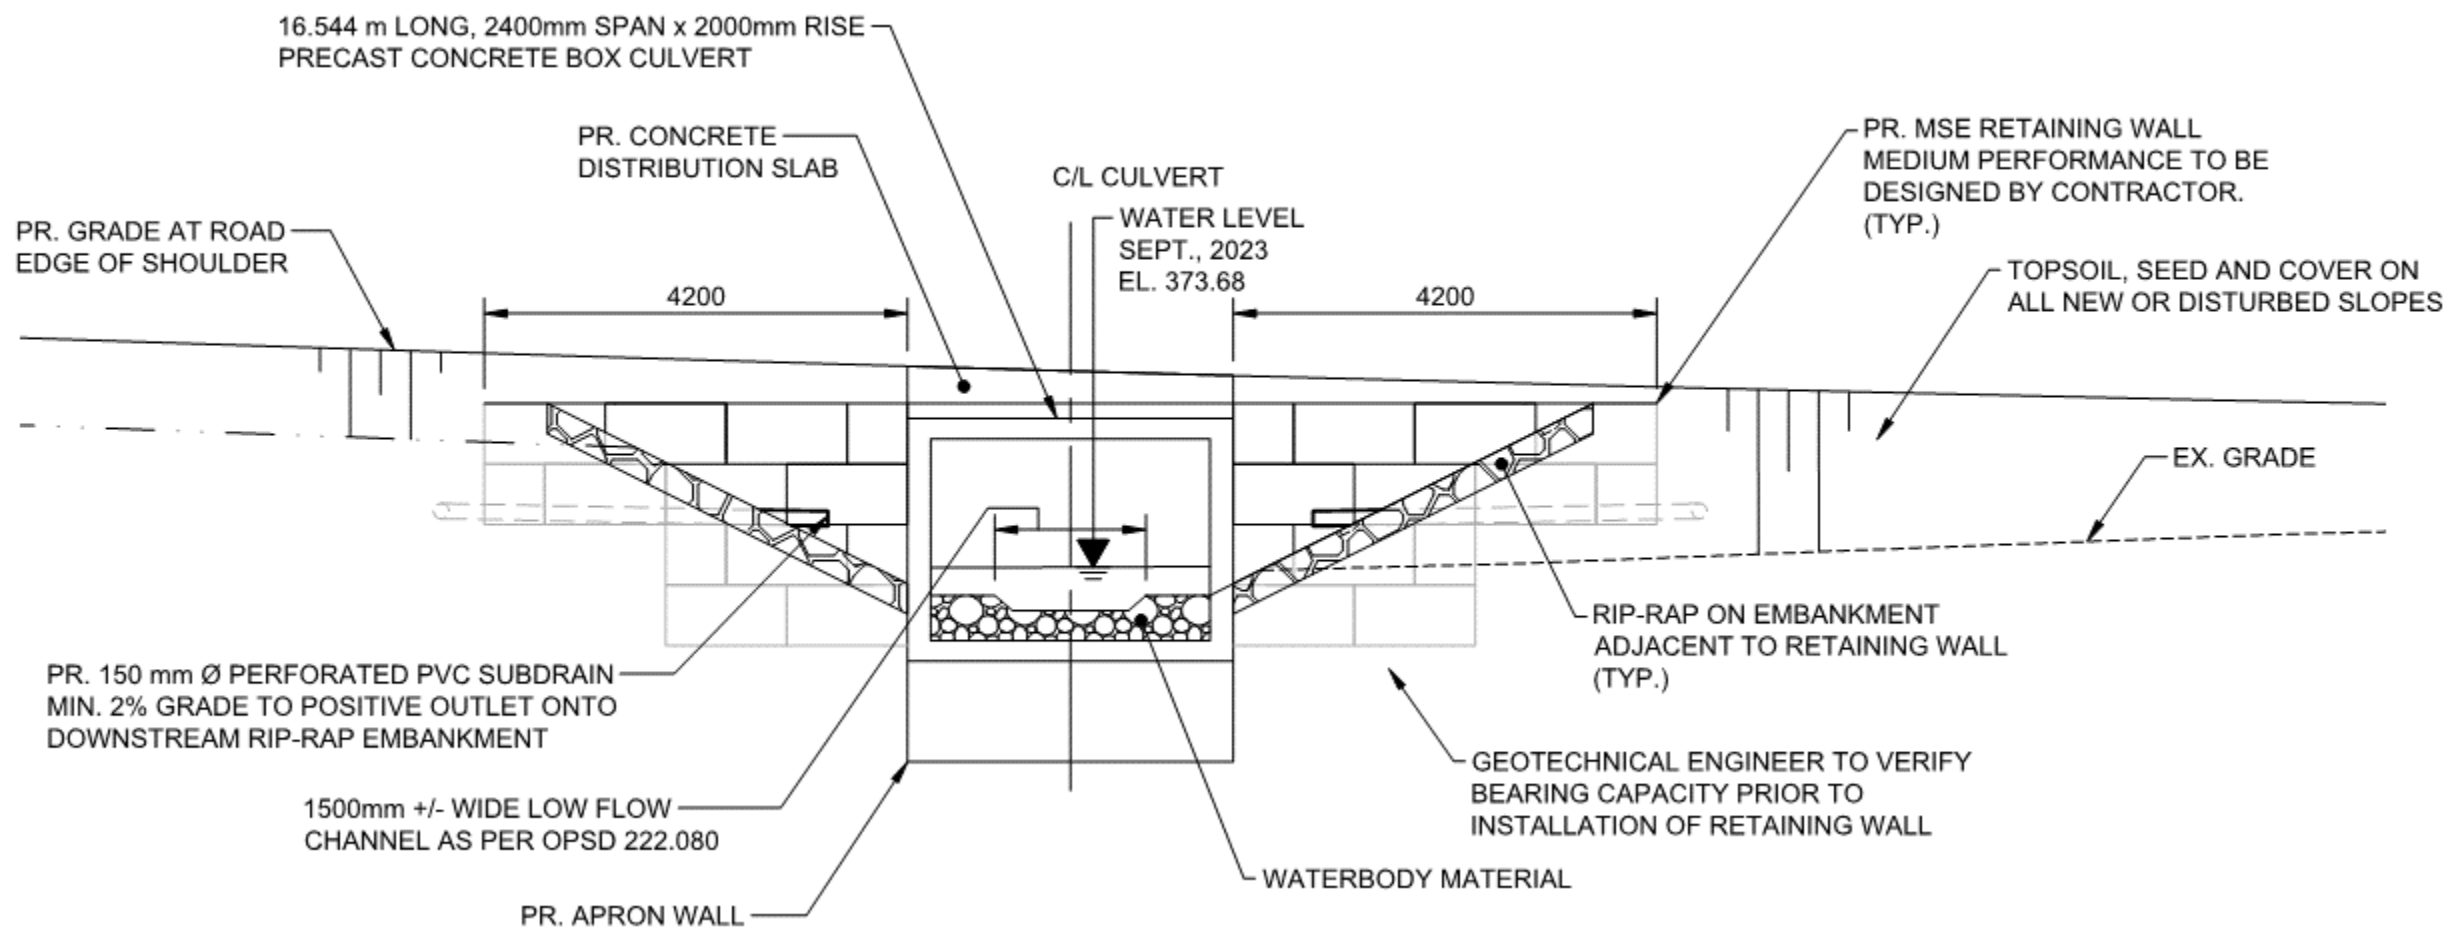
Cross-Section View of Conceptual Design, Bridge 32-P
